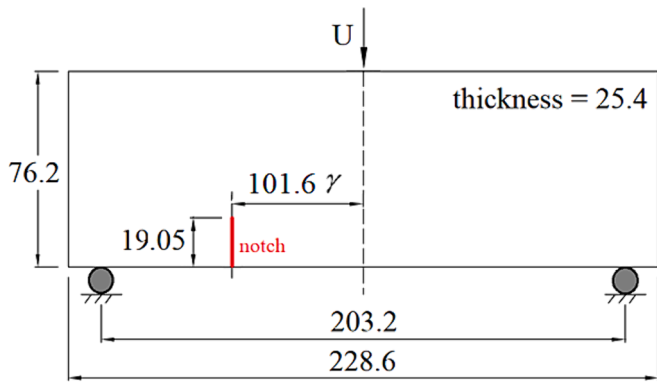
Geometrical details of the three-point bending experimental setup of John and Shah [57]. Dimensions in mm.
